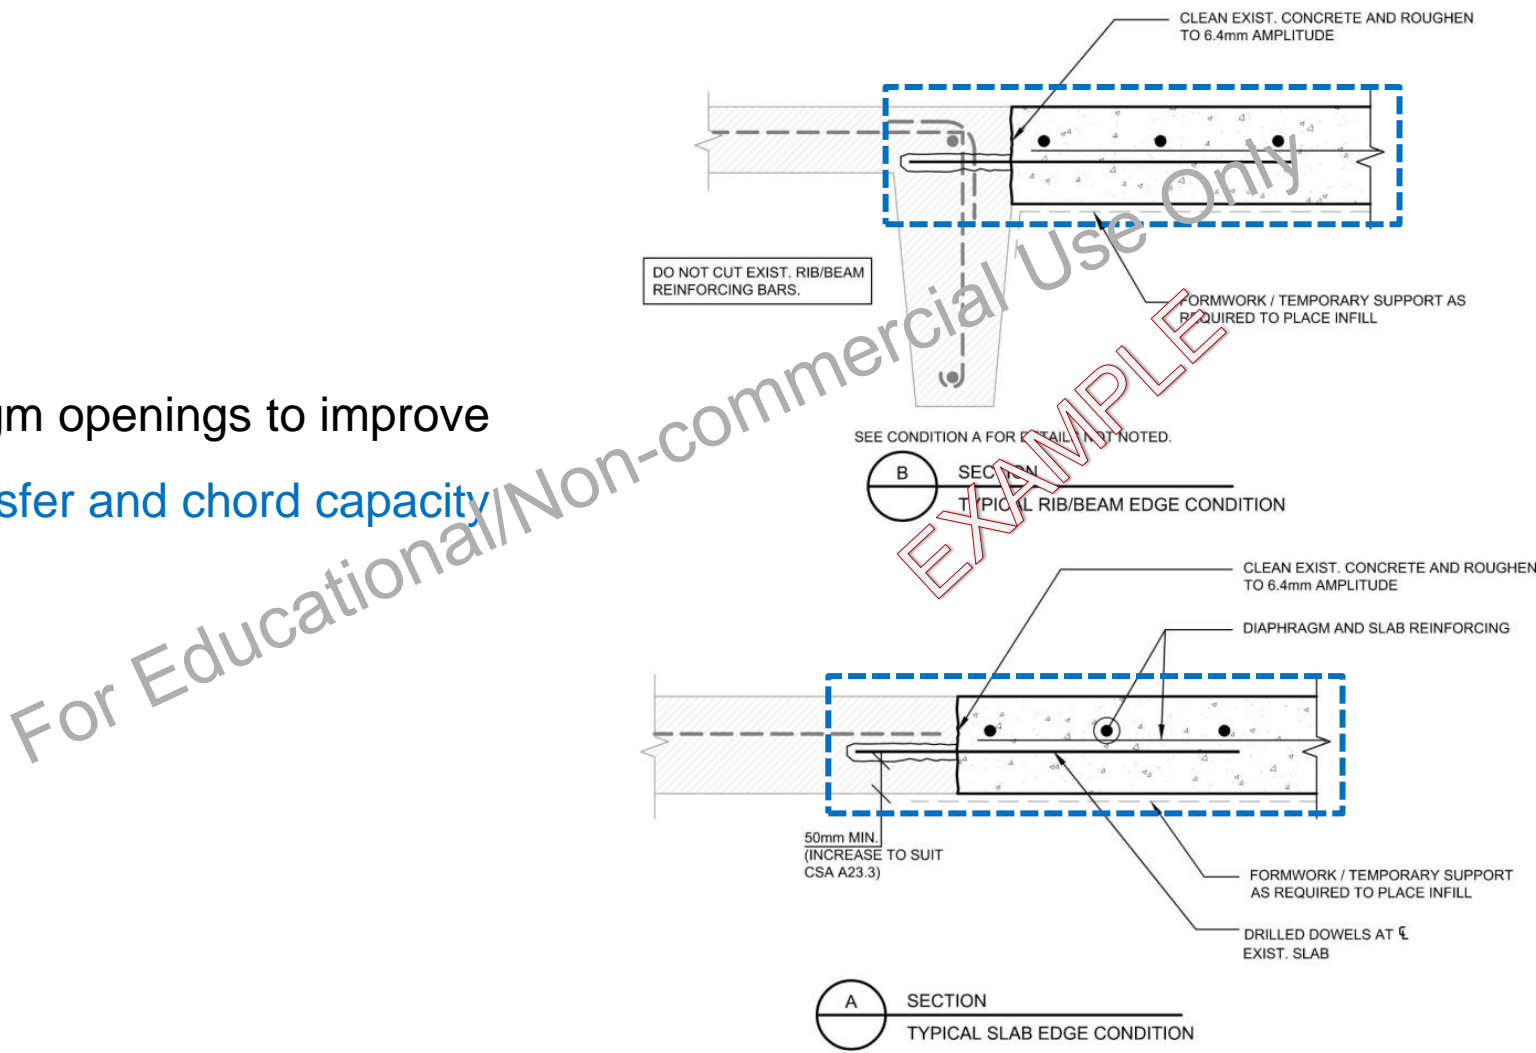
Infill existing opening in concrete diaphragm with reinforced concrete slab
